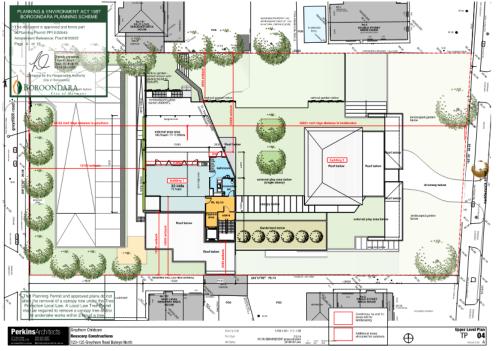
Endorsed Upper Level Floor Plan (Post18/00223 - 15/8/2015)
